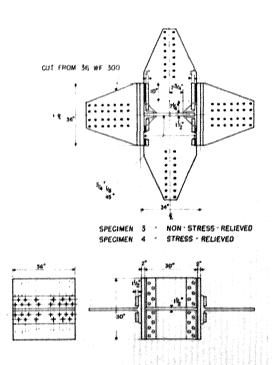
TEST SPECIMEN TYPE II (14th FLOOR BEAM-COLUMN CONNECTION)
